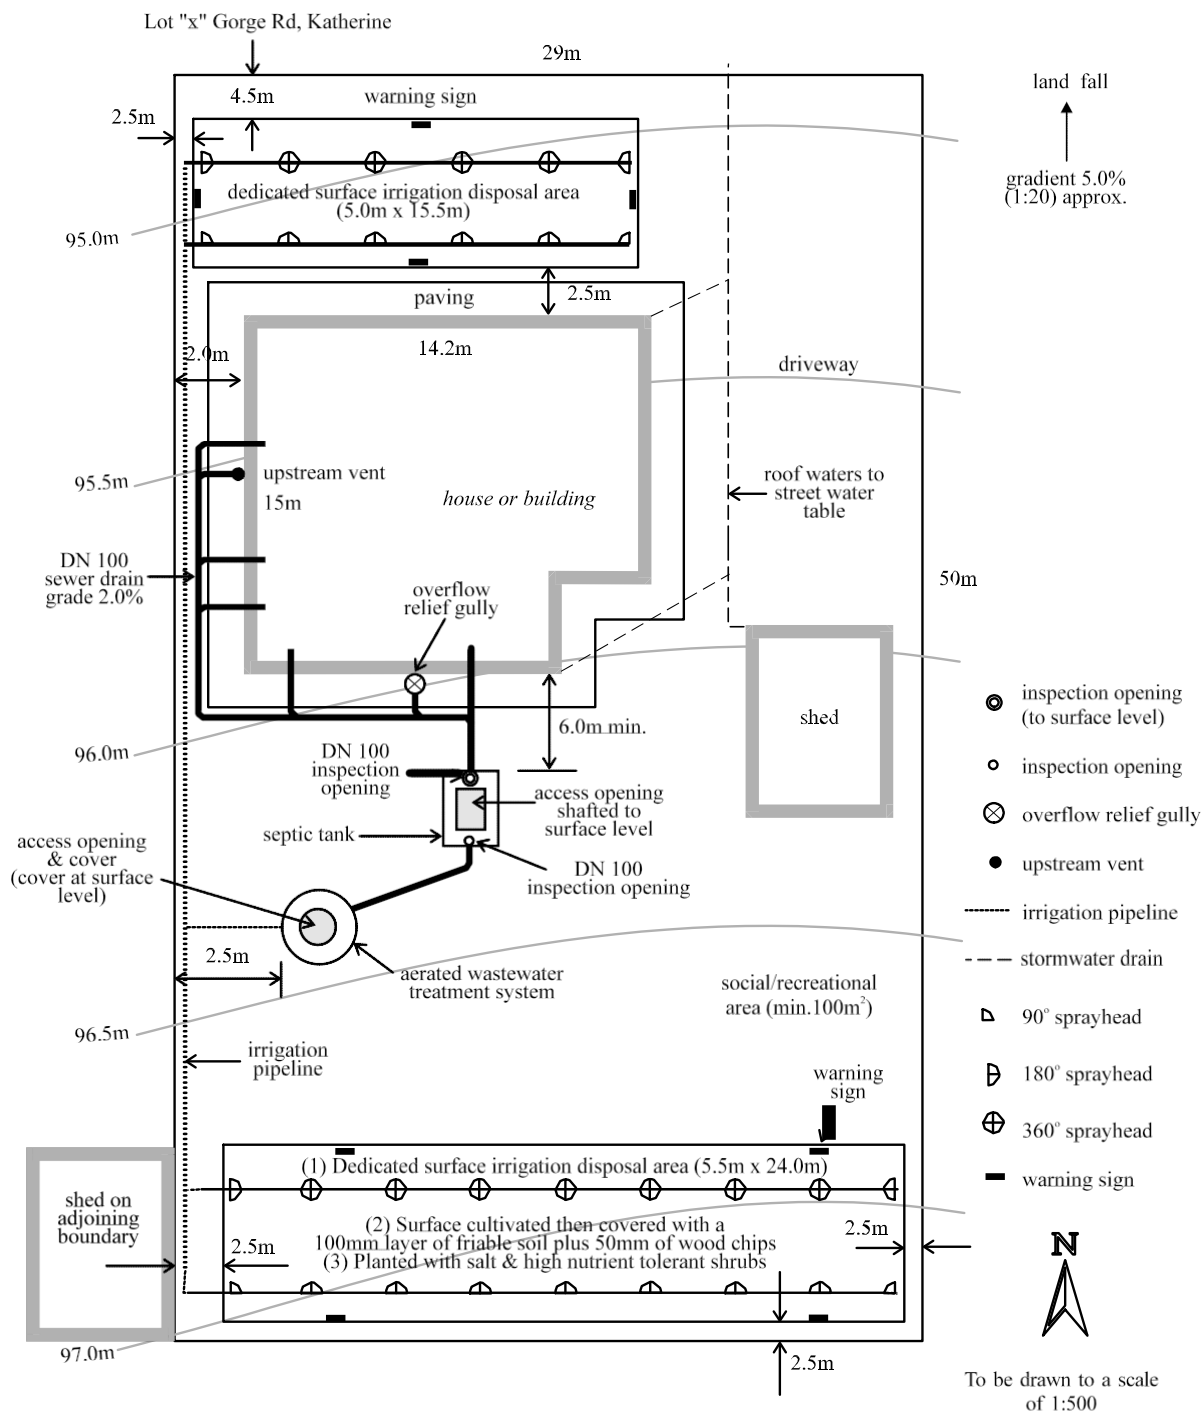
TYPICAL SITE LAYOUT PLAN - TWO TANK SYSTEM - SINGLE IRRIGATION AREA
